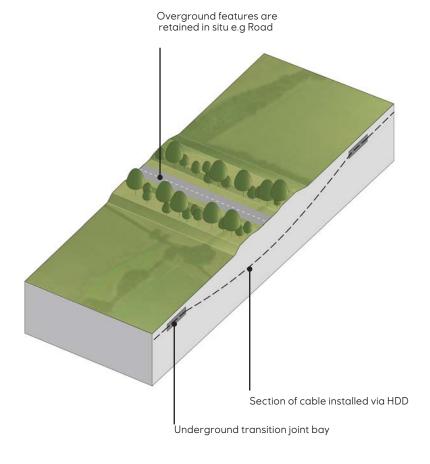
Approach to undergrounding of sensitive features (trenchless crossing)
